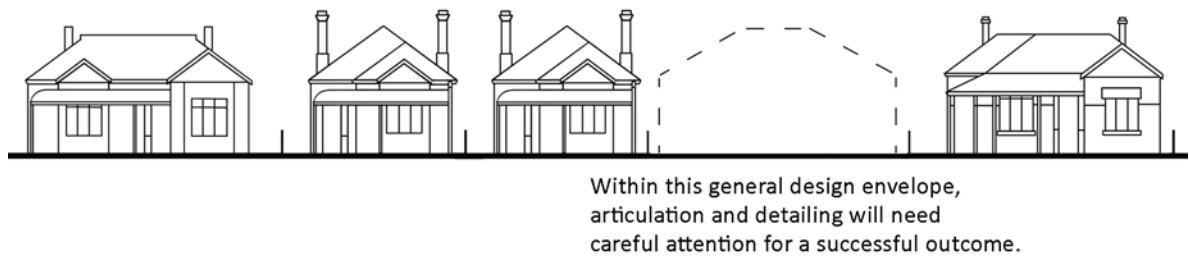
Example of a broad design envelope for a new building. Two storey wings can be included at the rear, provided these are not visually prominent in streetscape views.
